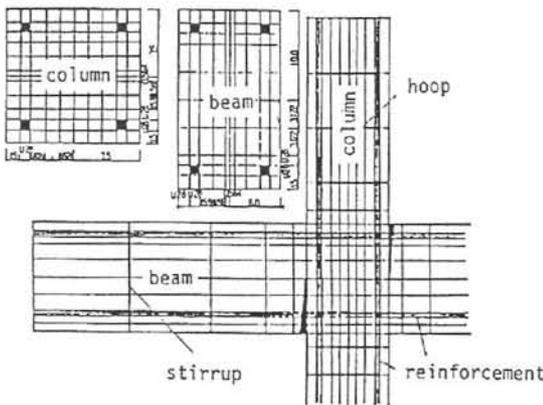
3-Dimensional Mesh Layout of Beam-Column Joint [2-19]
